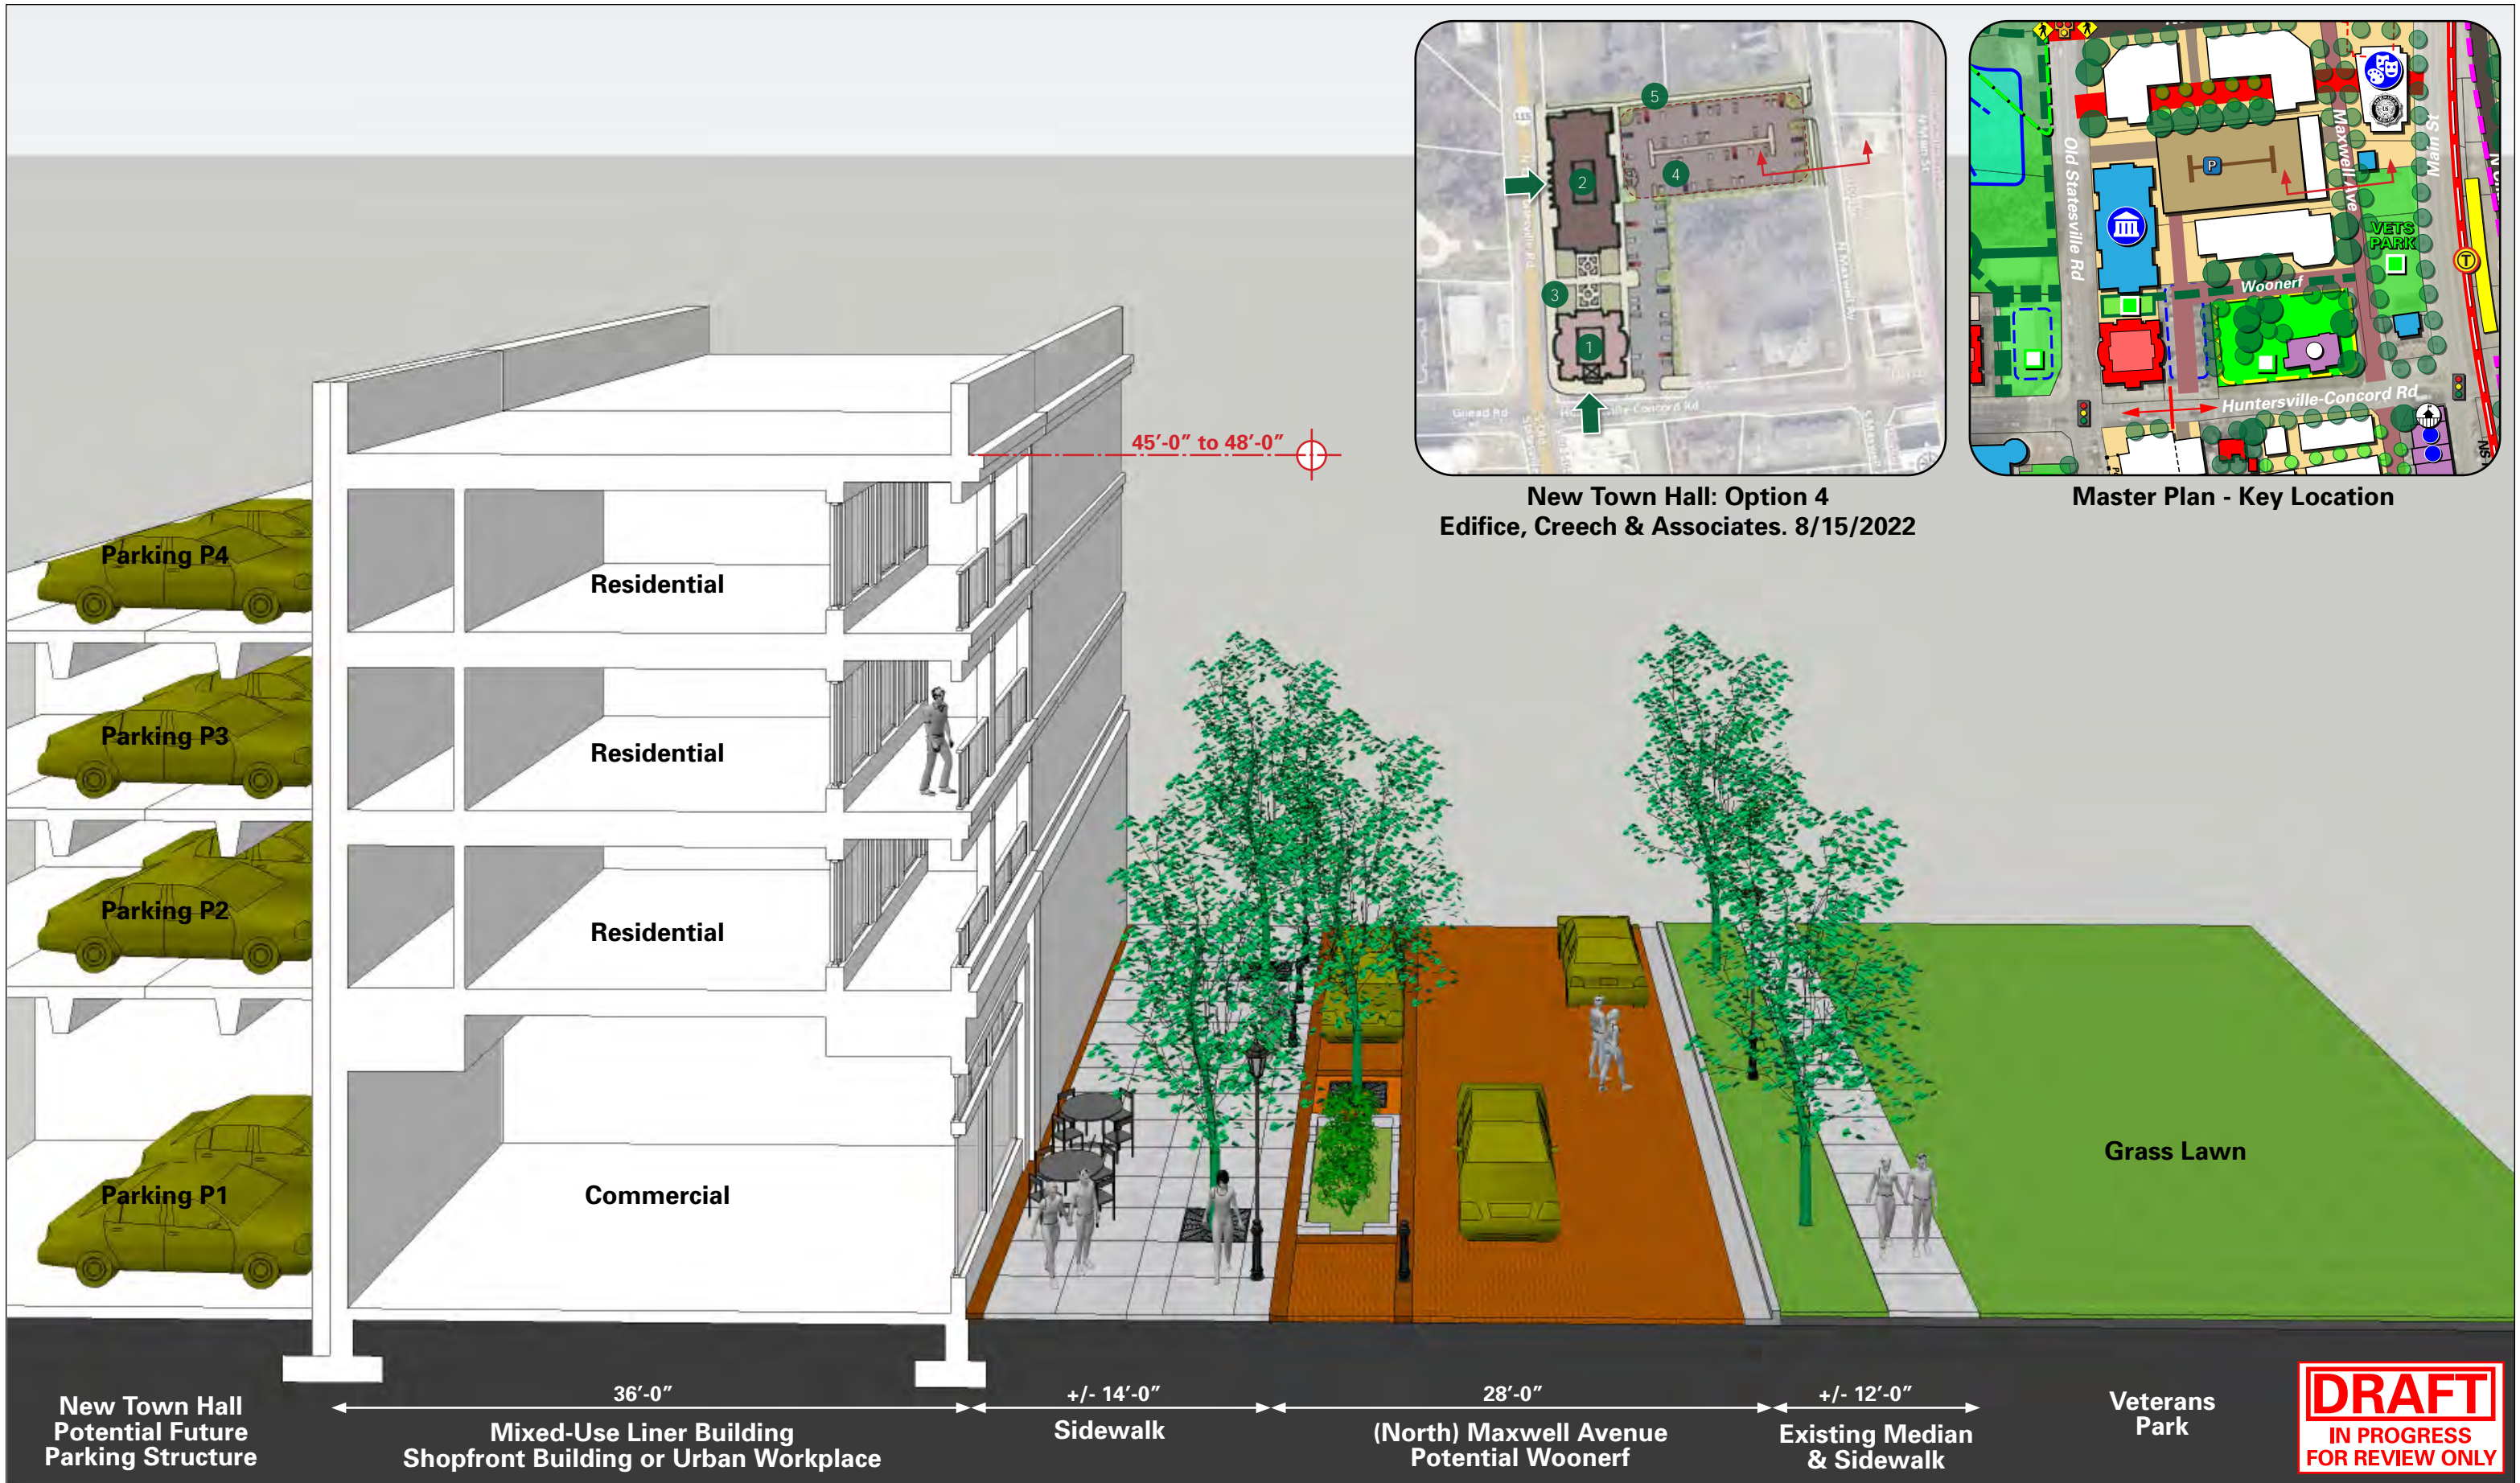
Conceptual Vision Plan: Northwest Quadrant - Future Town Hall Conceptual Parking Structure Frontage along Maxwell Avenue (Proposed Woonerf Street Type): Option C - Mixed-Use Liner Building (Shop Front Building or Urban Workplace).
